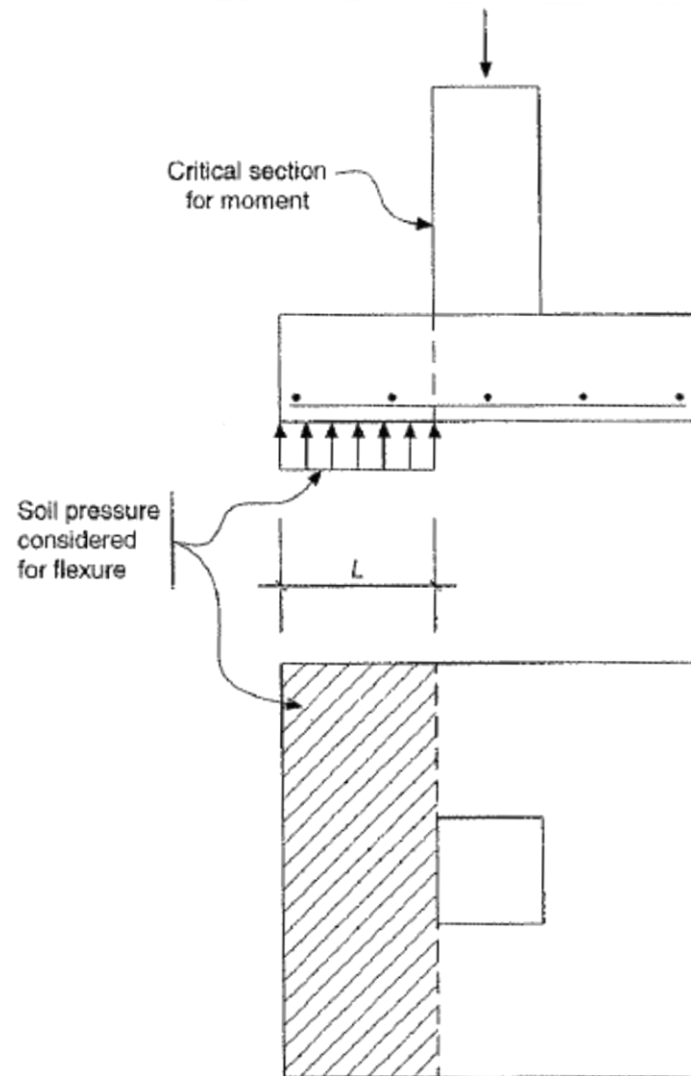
The length L of the footing cantilever subjected to bending.
